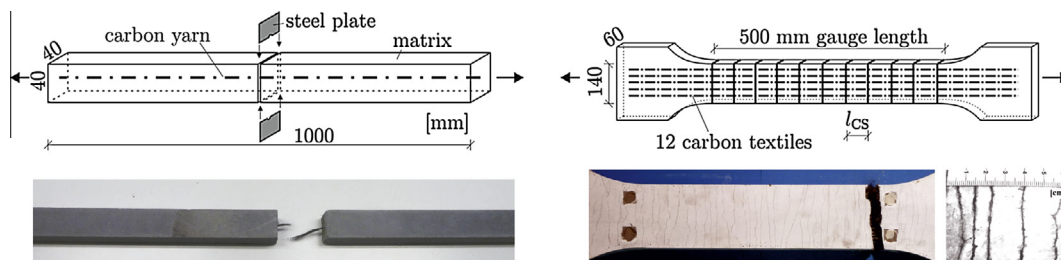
Single crack bridge tensile specimen (left), multiple cracking tensile specimen (right).
